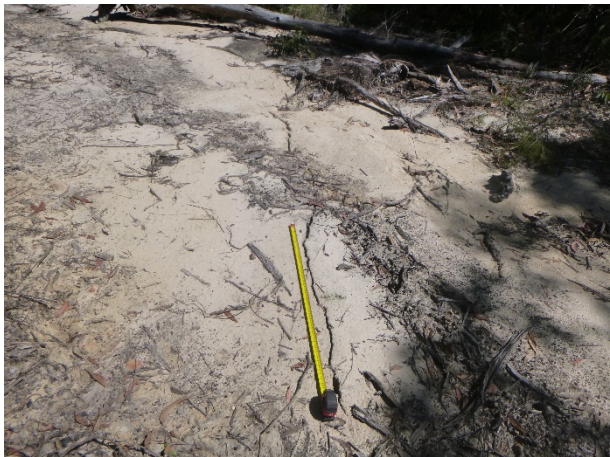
DA3B_LW16_034, looking at the length of soil cracking on access track parallel to WC15. Taken on 28/09/2020.
